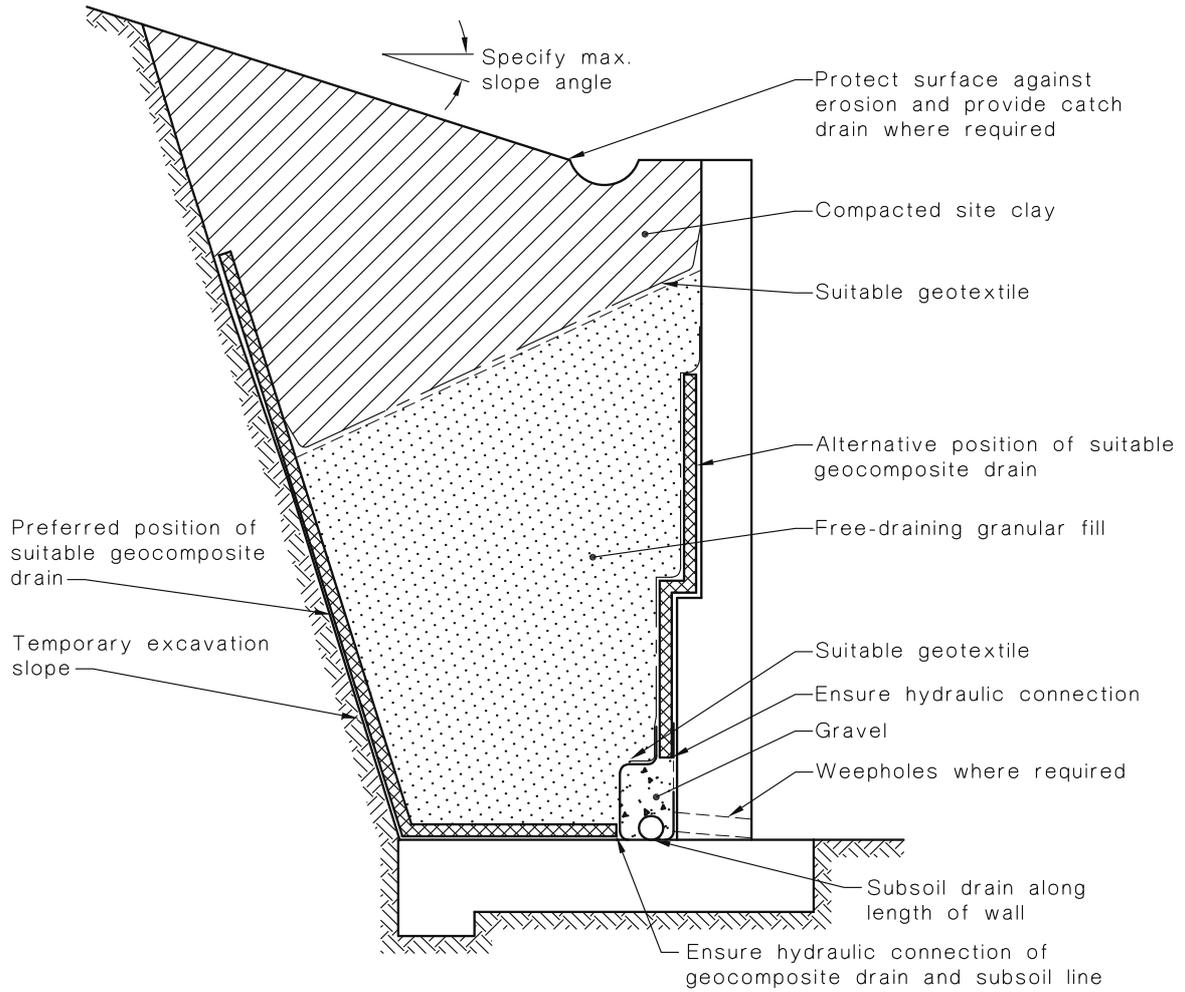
TYPICAL SECTION—CANTILEVERED WALL DRAINAGE, TYPE 2
